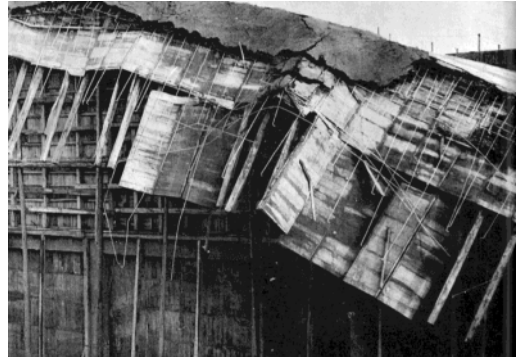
Collapse of a formwork structure during its construction (Saito 1954).
